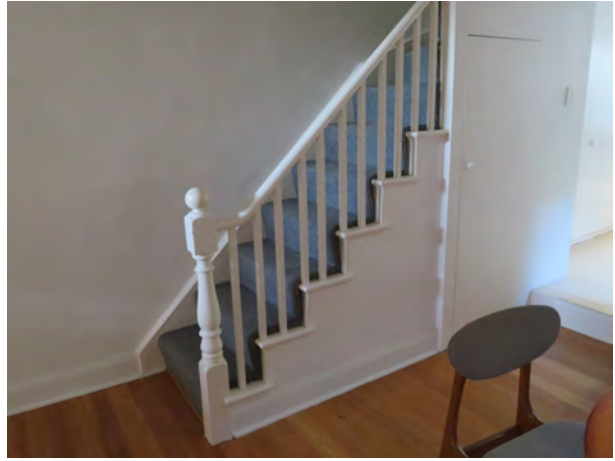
Later staircase to front hall of 92 Brougham Street.
